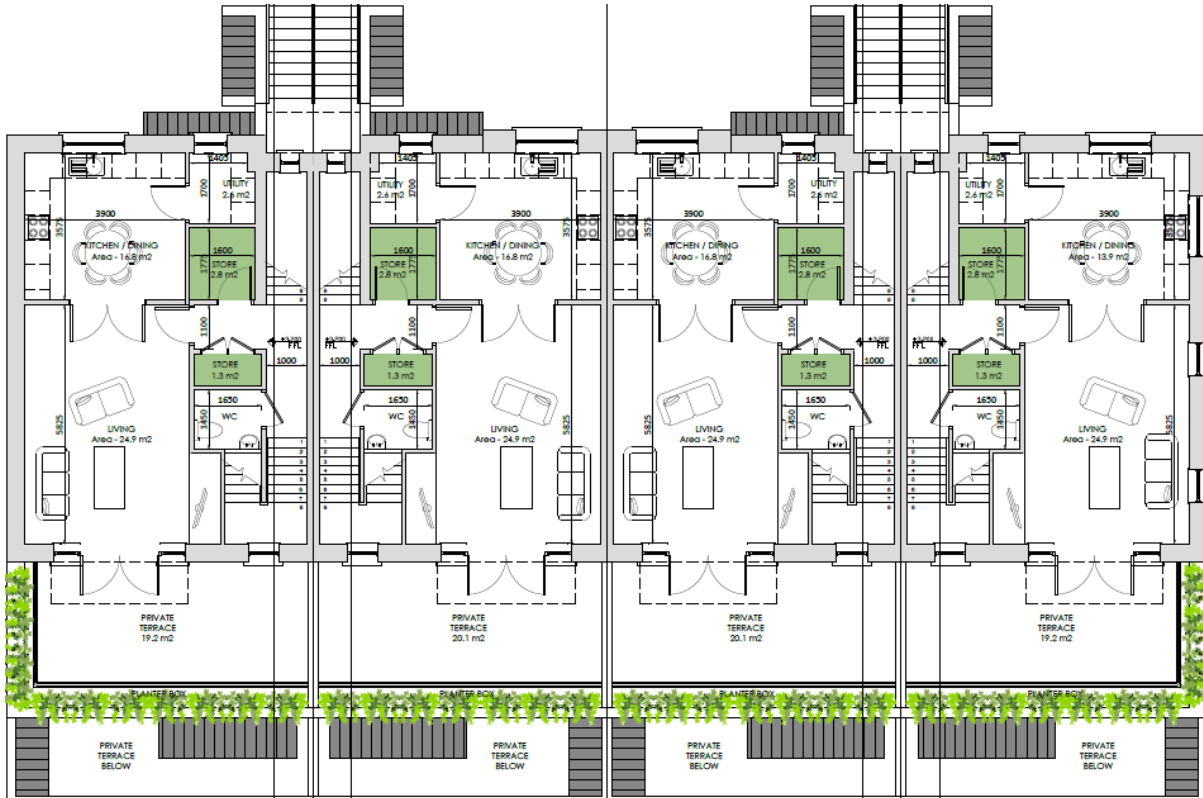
Proposed first floor plan of Duplex Apartment Blocks A, E, H, I & K
